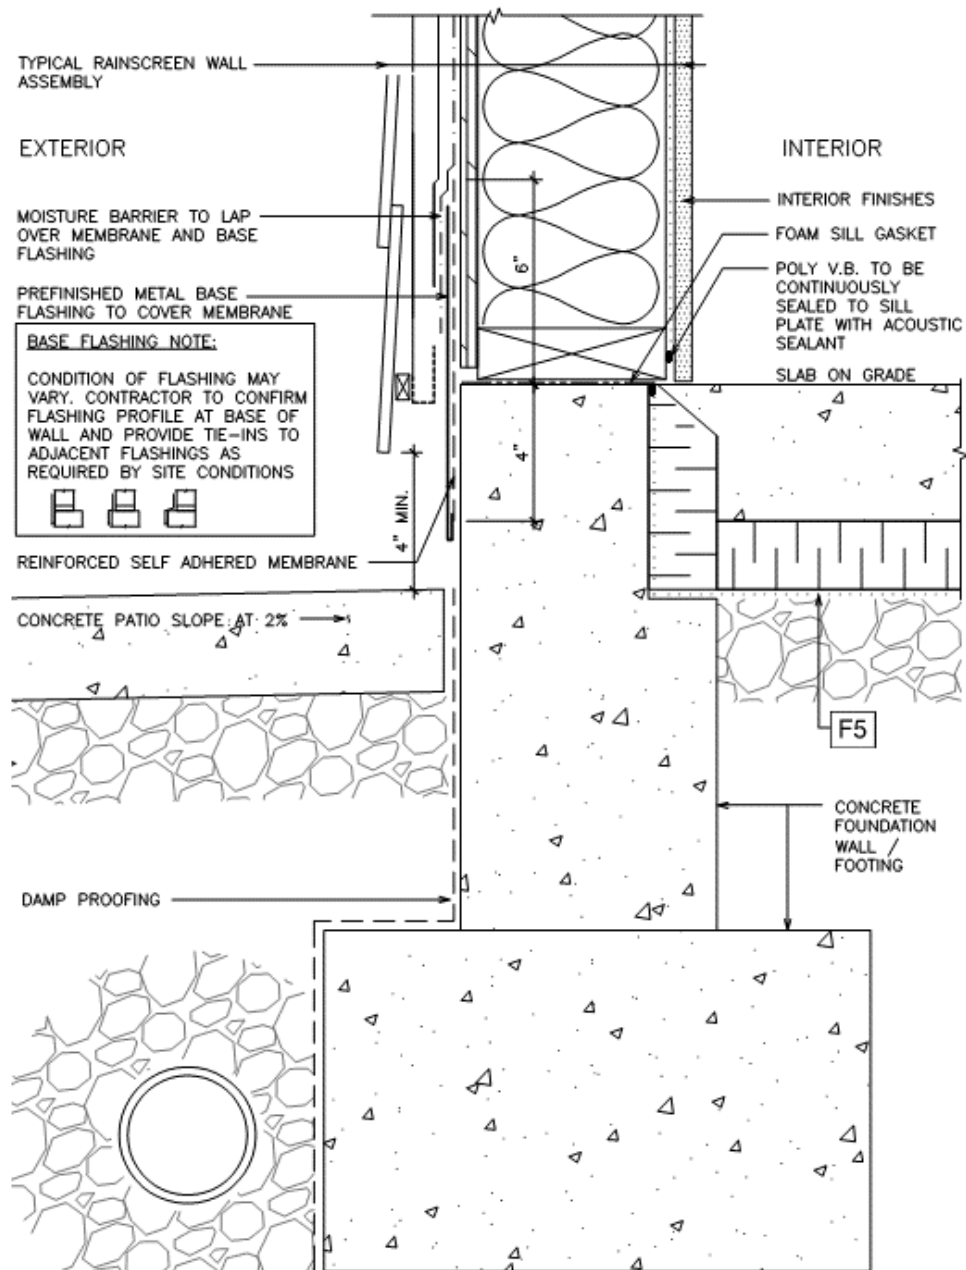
MCR BASE OF WALL AT FOUNDATION
